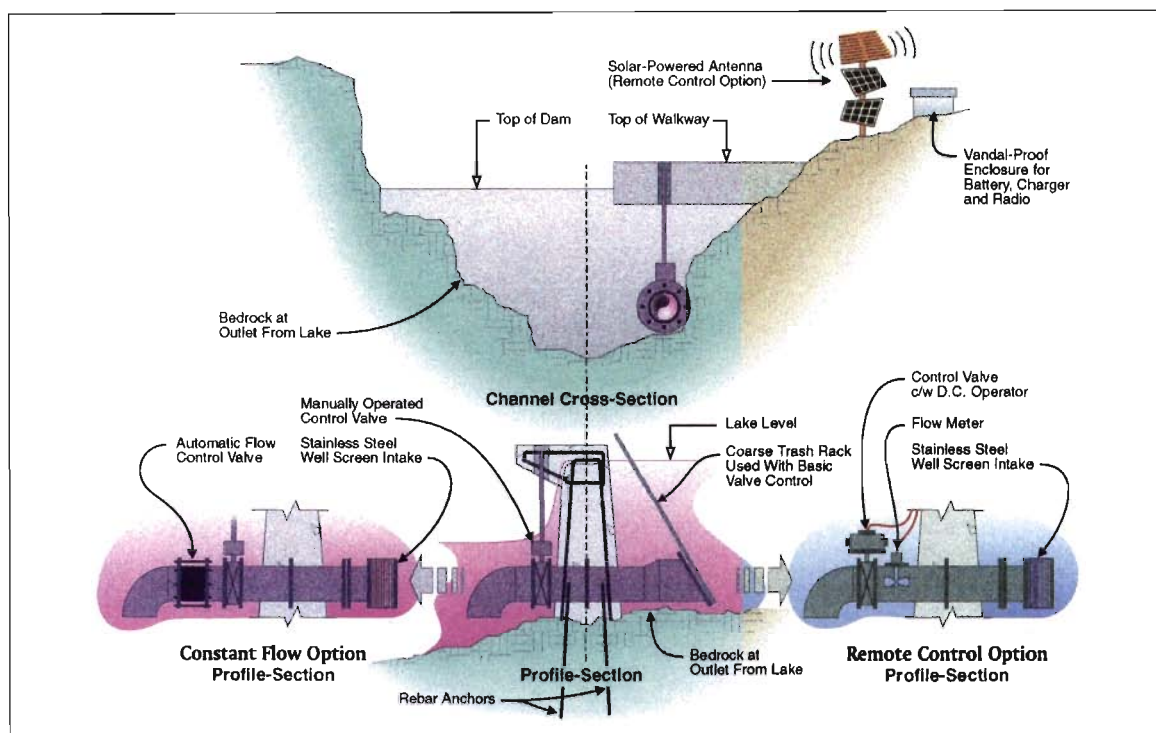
Conceptual design of a concrete low head dam constructed on bedrock.
